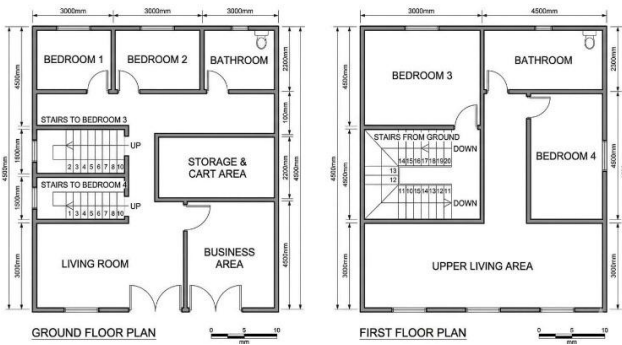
Floor plans of the ground floor (left) and upper floor (right) of Respondent A's existing house
